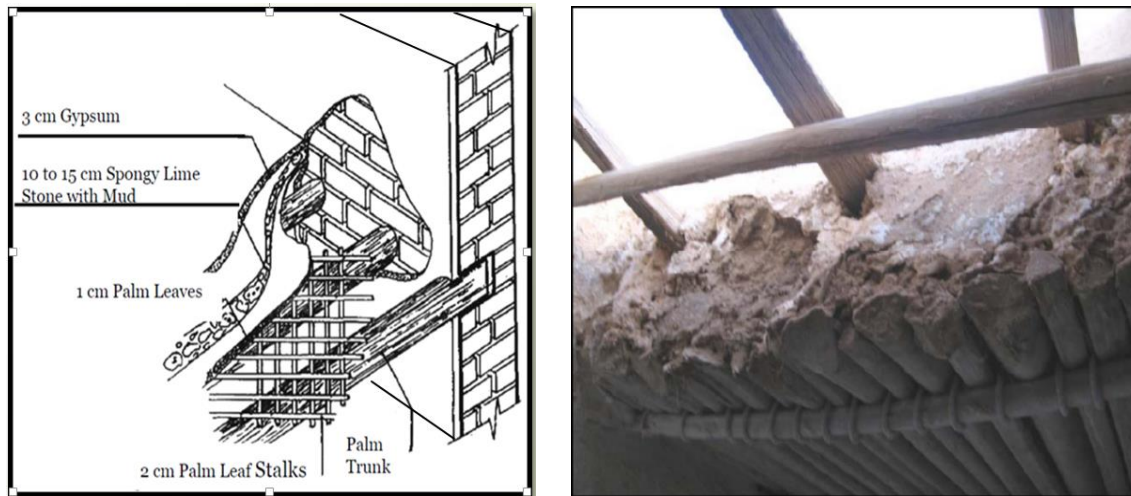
The details of the ceiling of traditional House in Ghadames (Report of Ghadames Libya 1980),(Ealiwa 2000).
